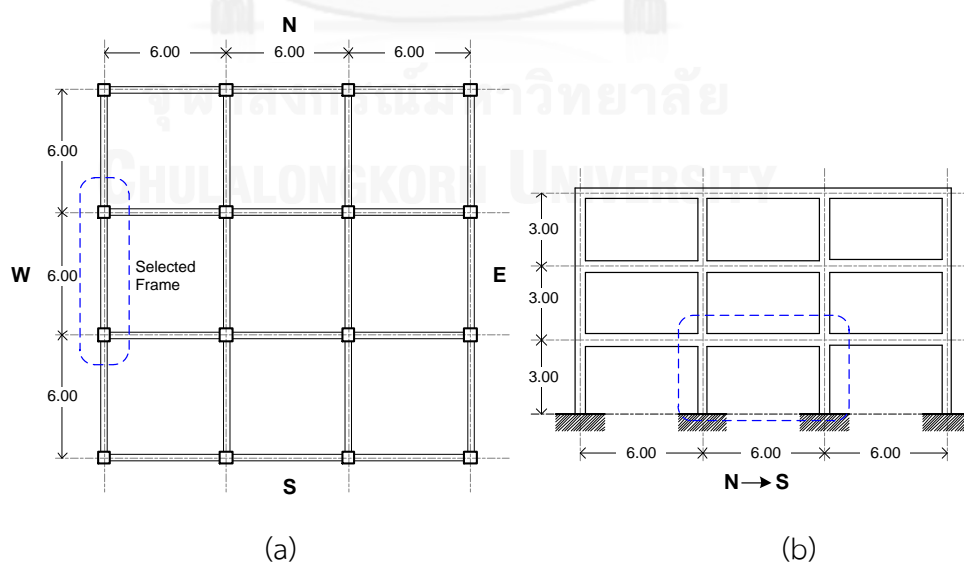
Prototype structure: (a) floor plan; and (b) elevation
